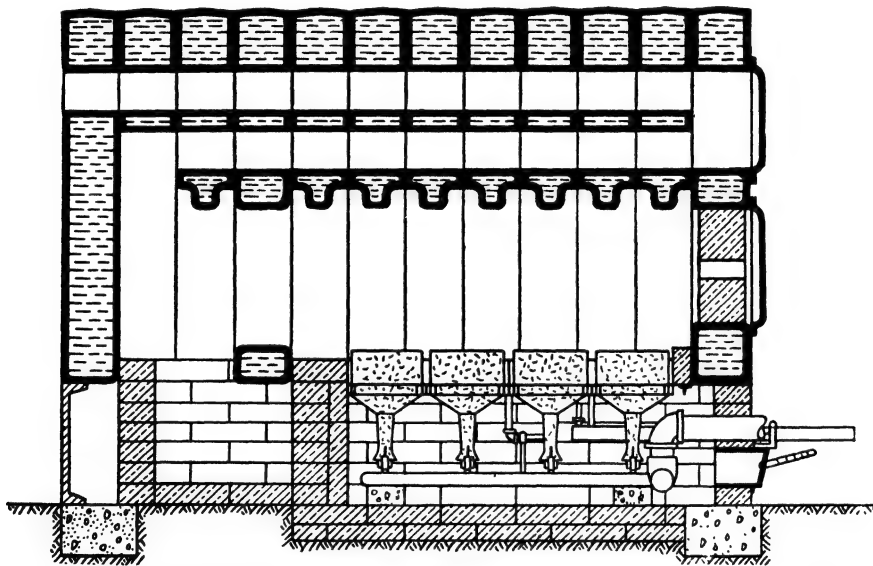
Cast-iron sectional boiler. (Courtesy of Webster Engineering Company.)
